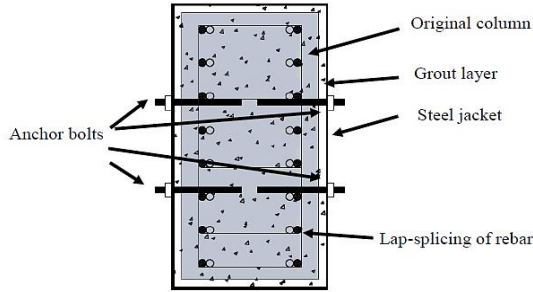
Steel jacketing retrofit configuration for a reinforced concrete column with inadequate lap-splice detailing (Aboutaha et al., 1996).
